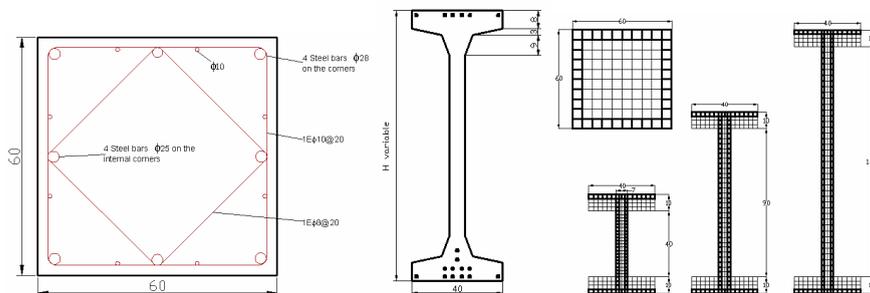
Columns and beam reinforcements and fiber model of the sections.
